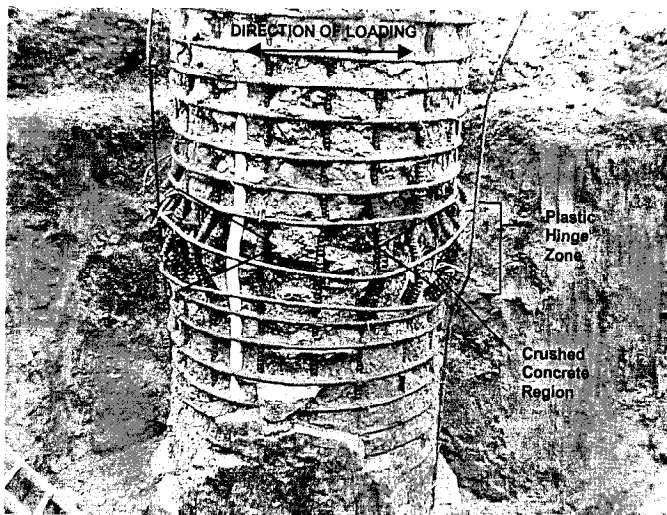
Photograph of plastic hinge, showing zone of crushed concrete
